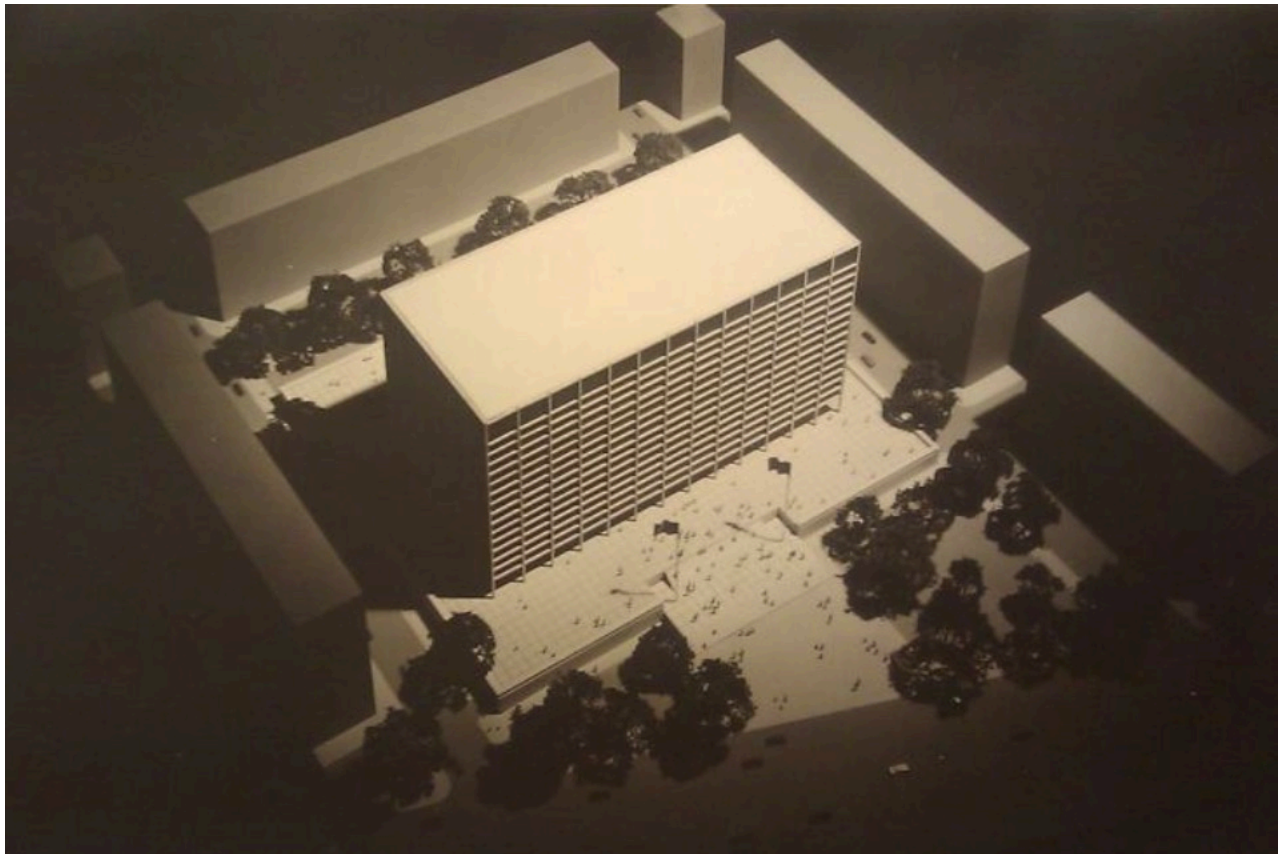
Plan of Pennsylvania Avenue, with the finalized design for the FBI Building.
